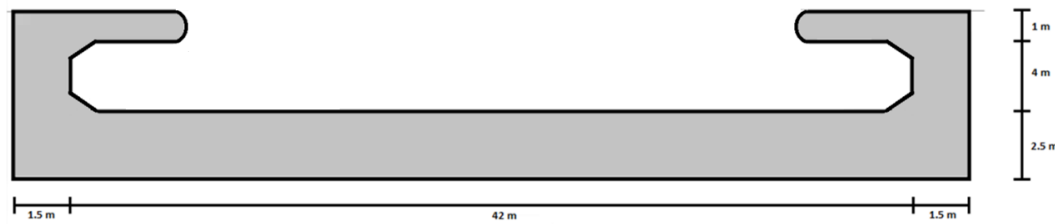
Cross-section bottom recess with dimensions to prevent floating.
